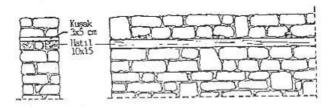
The use of "hatil" – the horizontal timber beam- in the stone wall.
